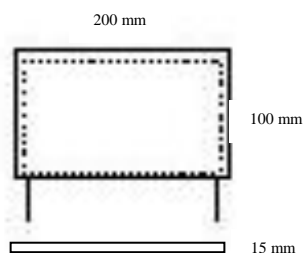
Flat Jack Size Sketch (RILEM LUM Standard D.2)
